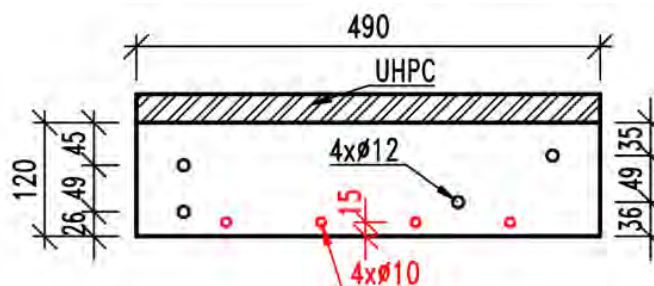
Cross-sectional dimensions of original concrete panel and reinforcement of this panel.
